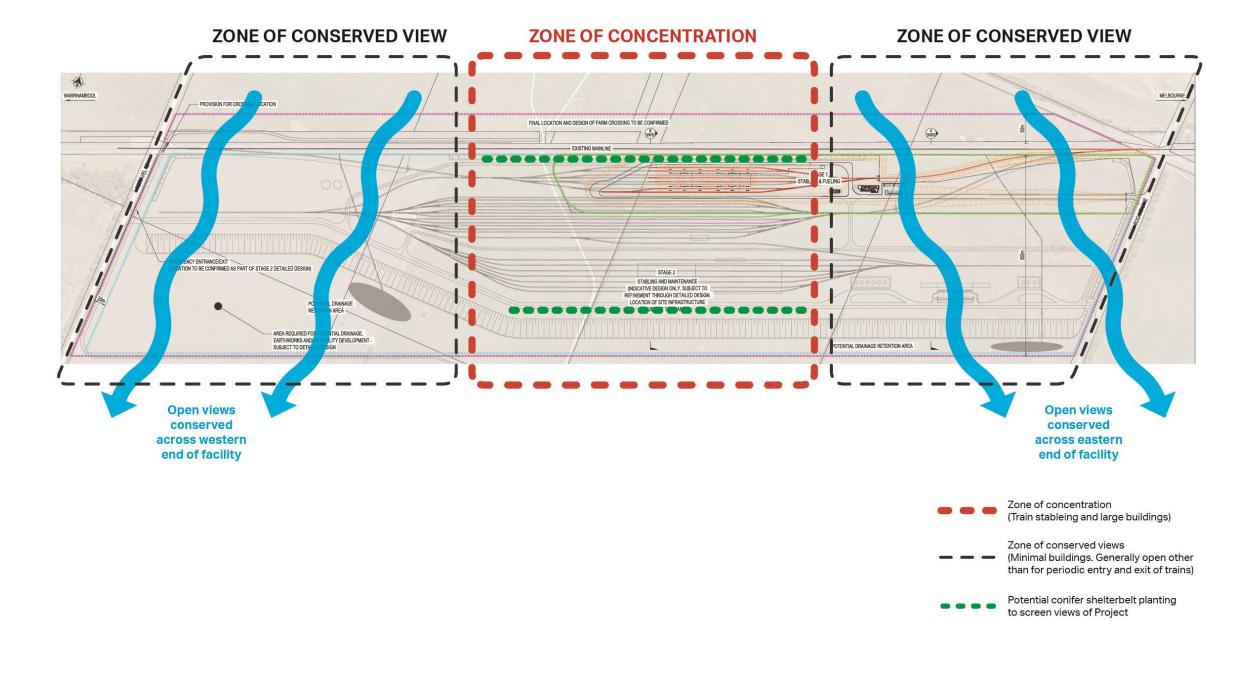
Plan view illustrating high level principles with potential to conserve existing rural views from sensitive visual receptors
